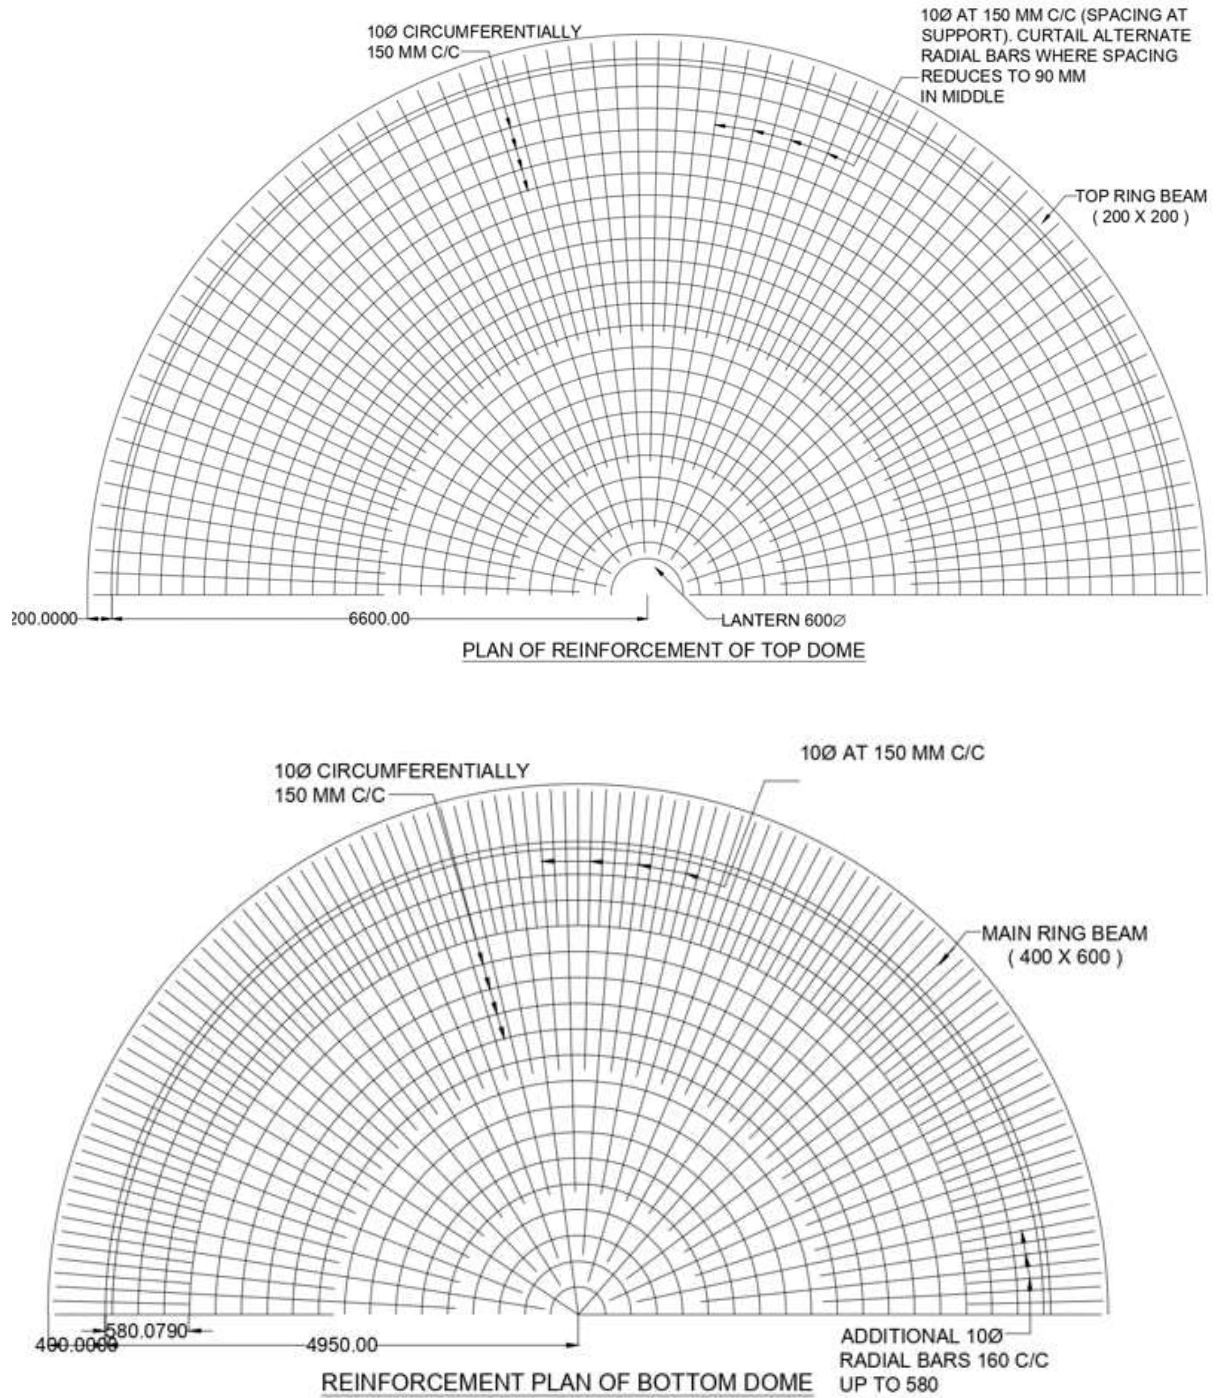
Reinforcement plan of top and bottom dome of hybrid Intze tank
